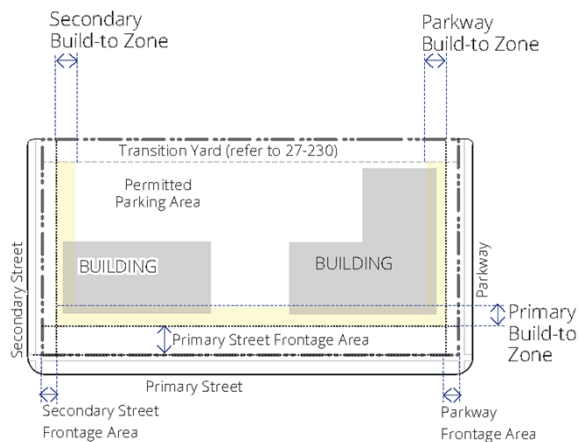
Corner and Build-to Zones on Different Street Types
